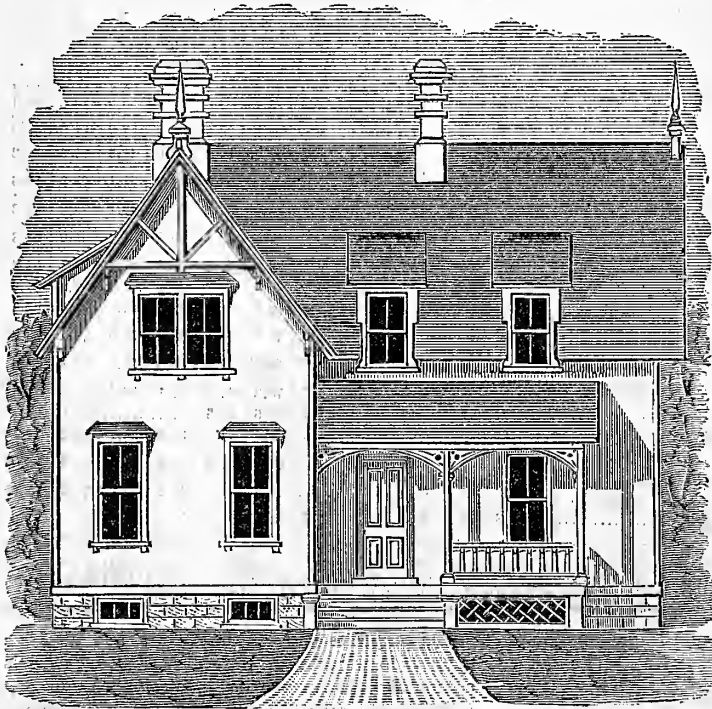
FRONT ELEVATION OF COTTAGE.
